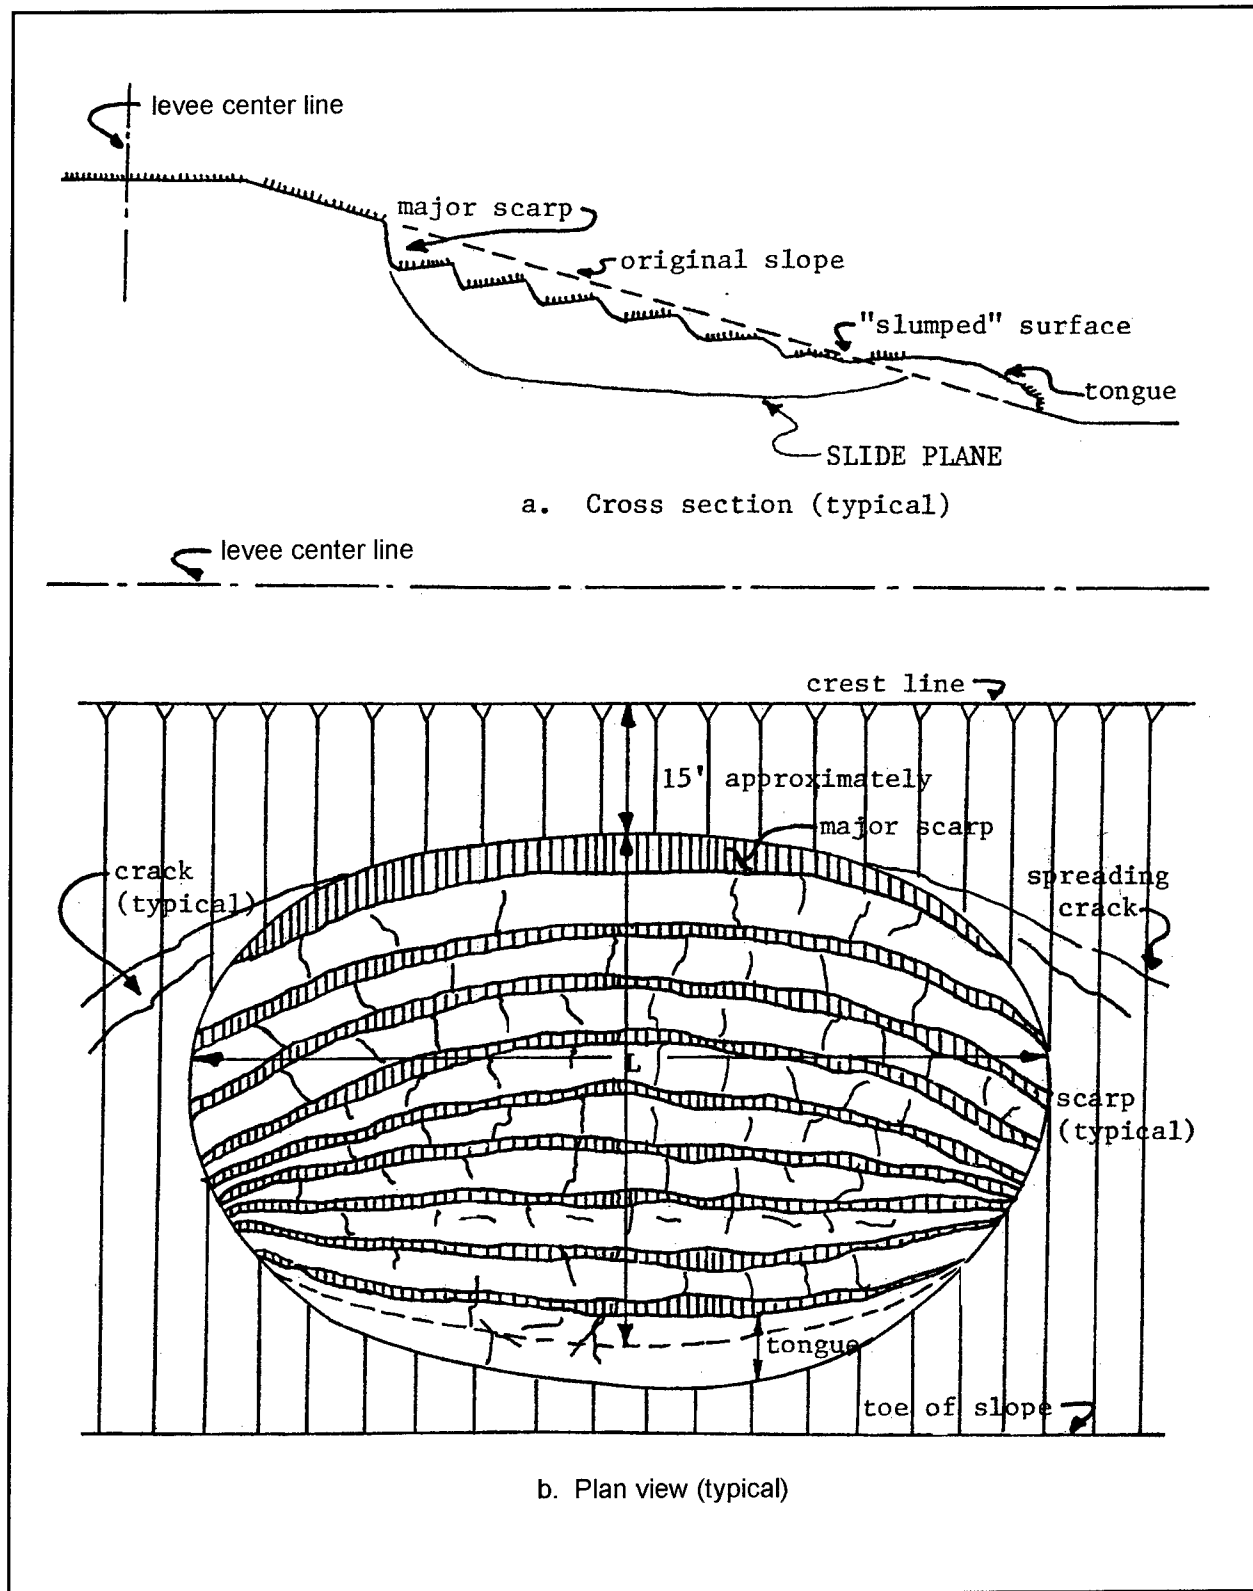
Typical slide in Mississippi River levee (after Sills and Templeton 1983)
